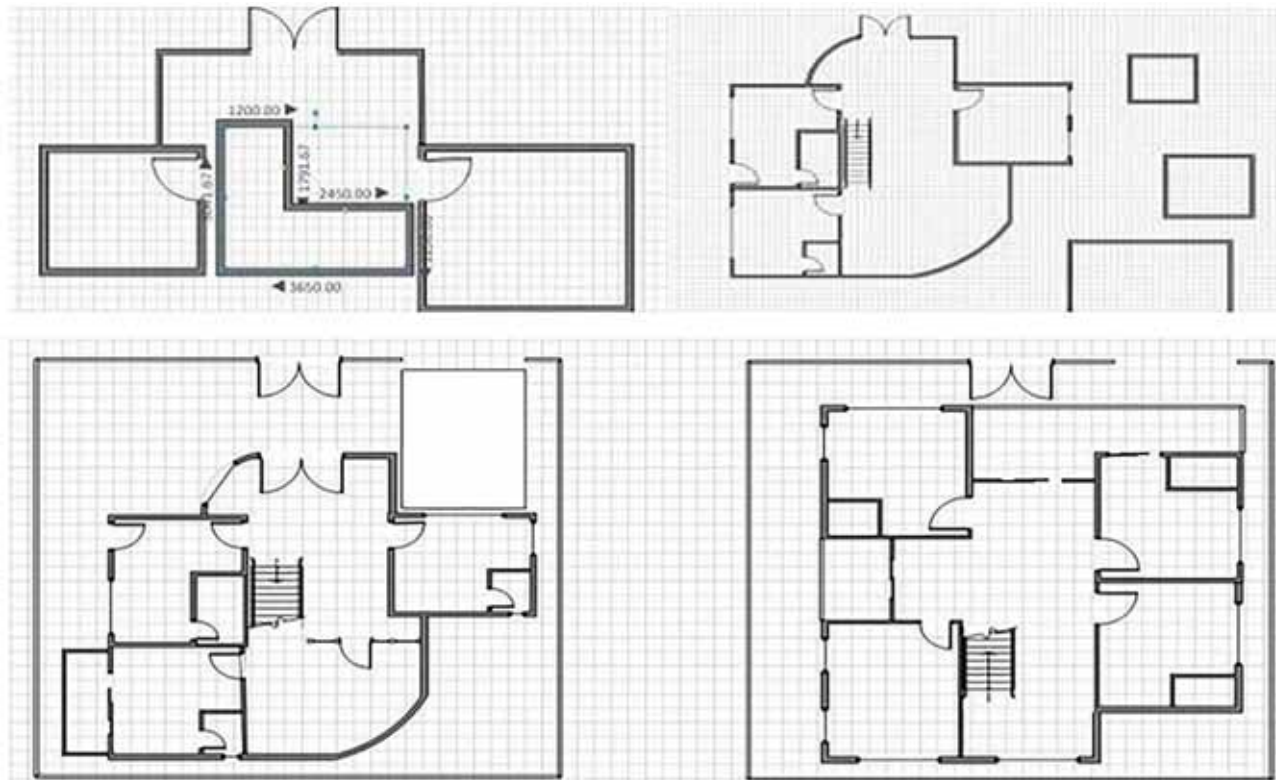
Initial floor plan and layouts of Microsoft Visio.
